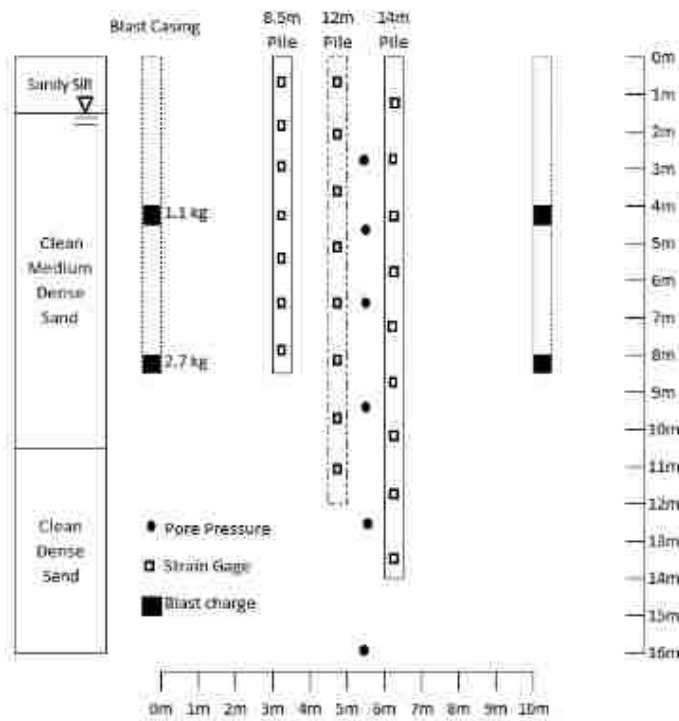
Elevation view of test piles, blast charges, and instrumentation relative to the soil profile (Rollins and Hollenbaugh 2015).
